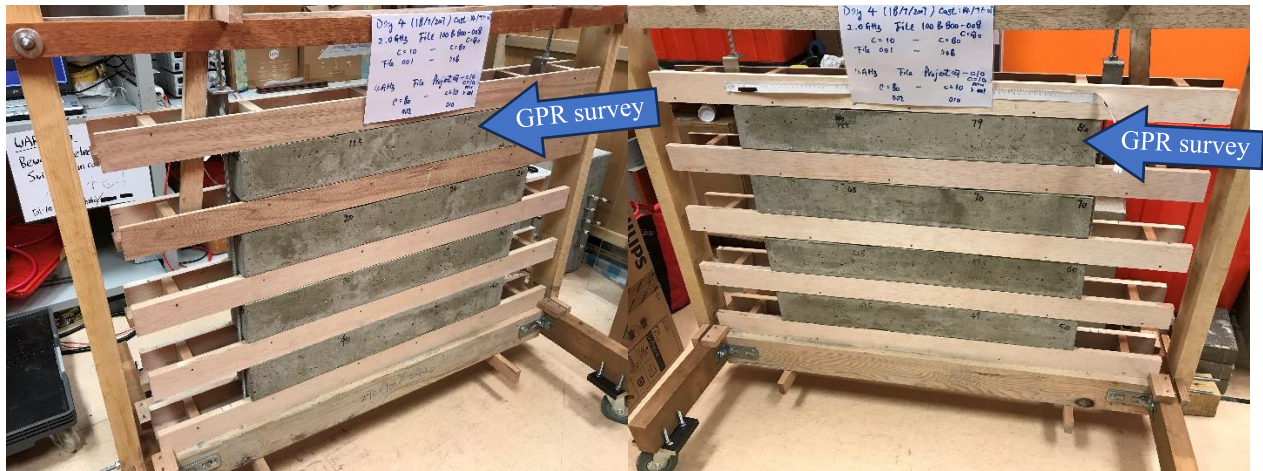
GPR test survey on the casted LGSI concrete beams with 10mm diameter rebars
